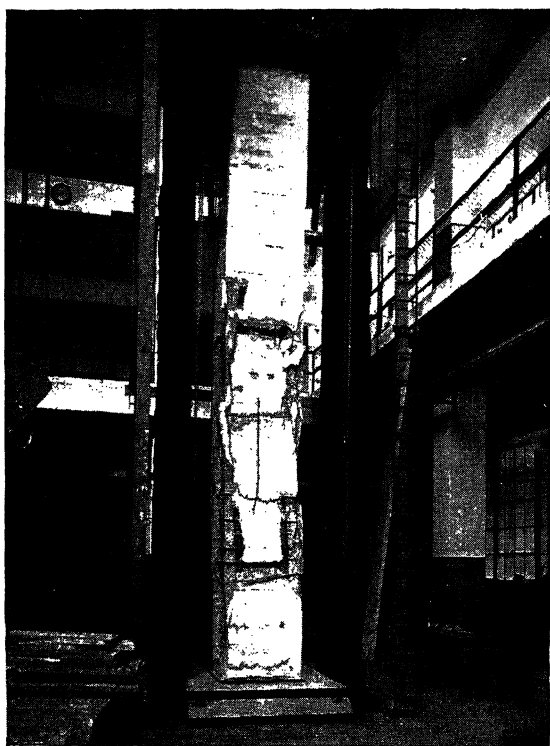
Concrete-encased model of tower columns of the George Washington Bridge at the Bureau of Standards, Washington, D.C.
